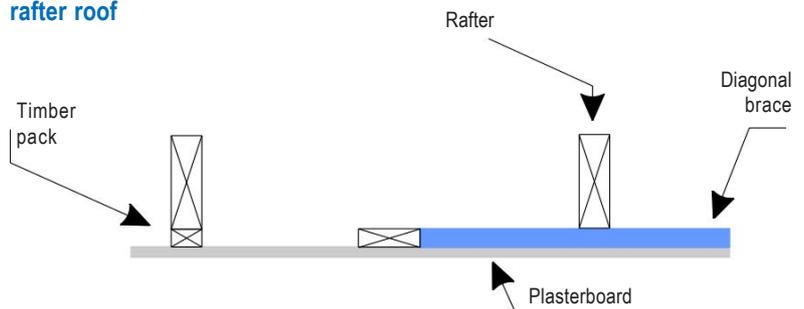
General arrangement of bracing for 'Room in the Roof' trussed rafter roof
